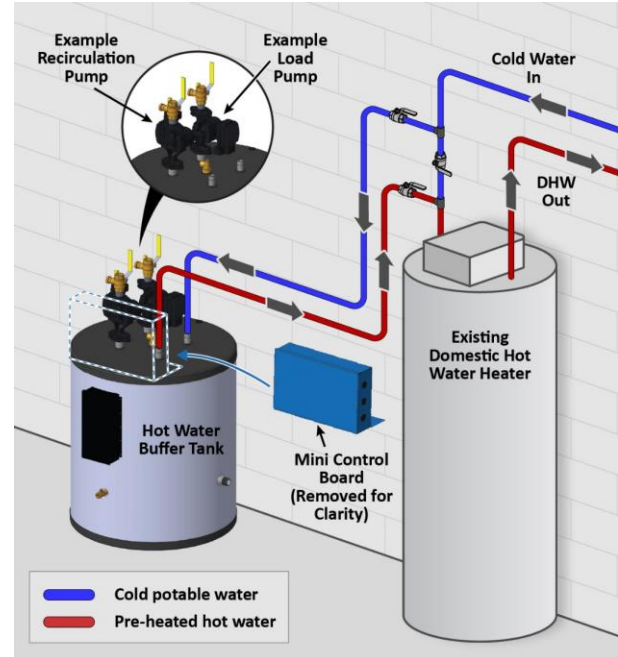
Recommended domestic hot water pre-heat plumbing arrangement with Buffer Tank
